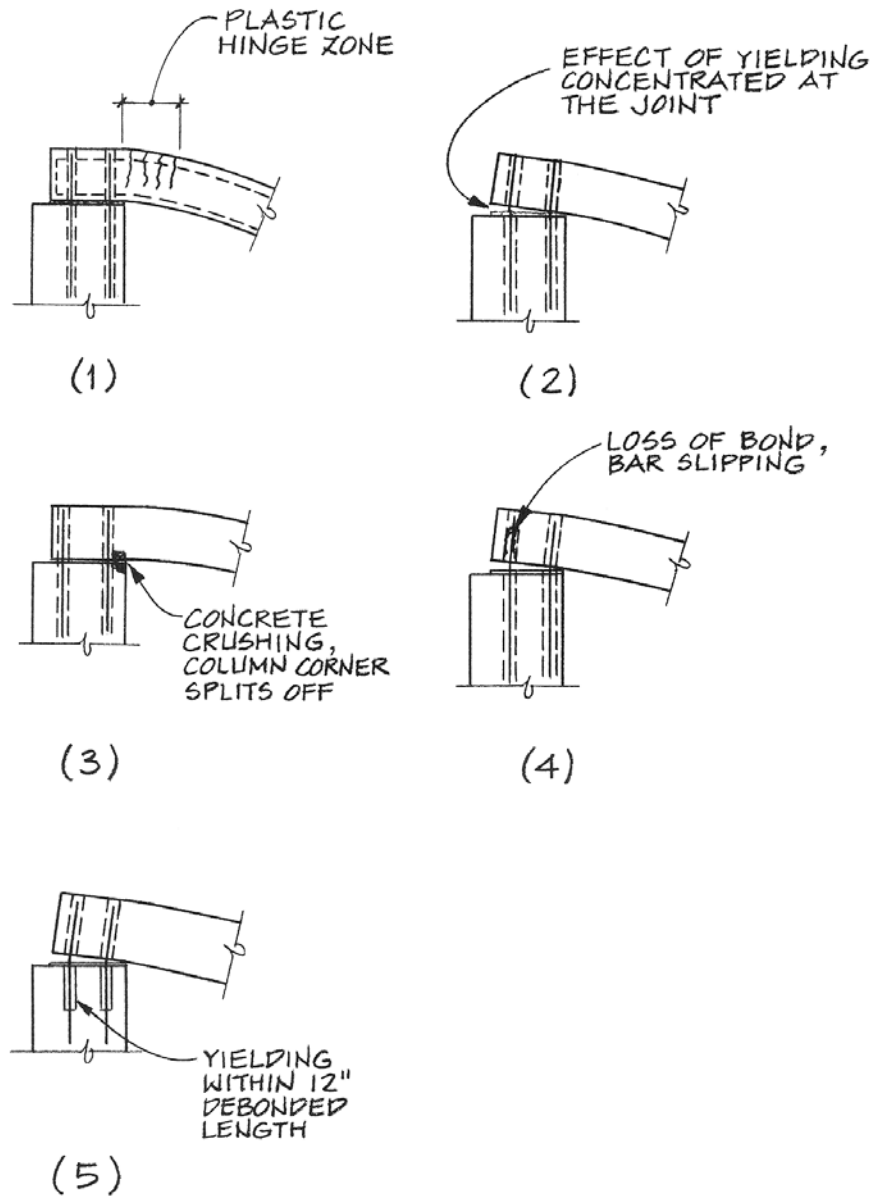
Flexural Failure Mechanisms for Precast Connection Using Grouted Ducts
